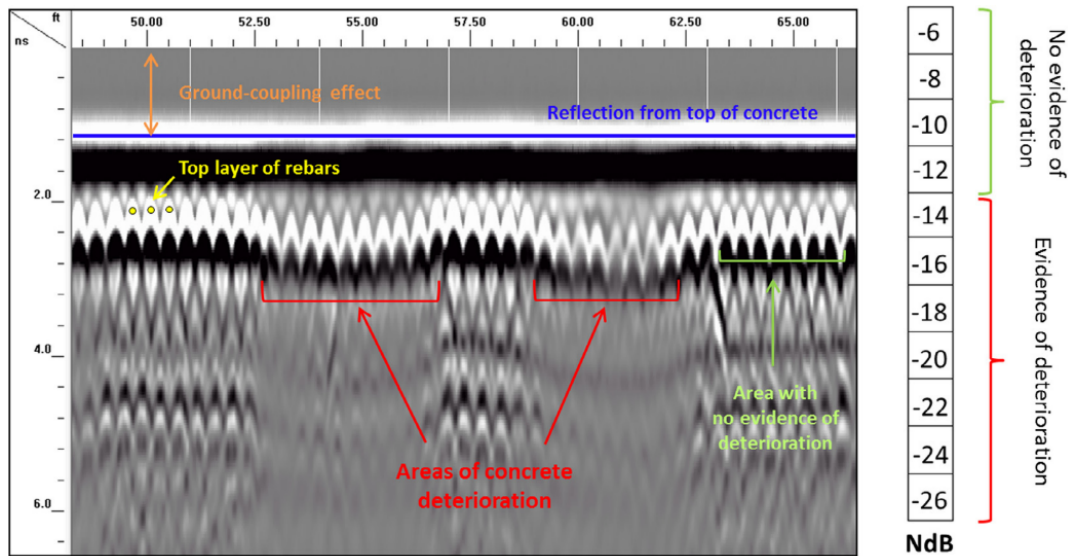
GPR scan showing concrete deterioration on bridge deck [46].
